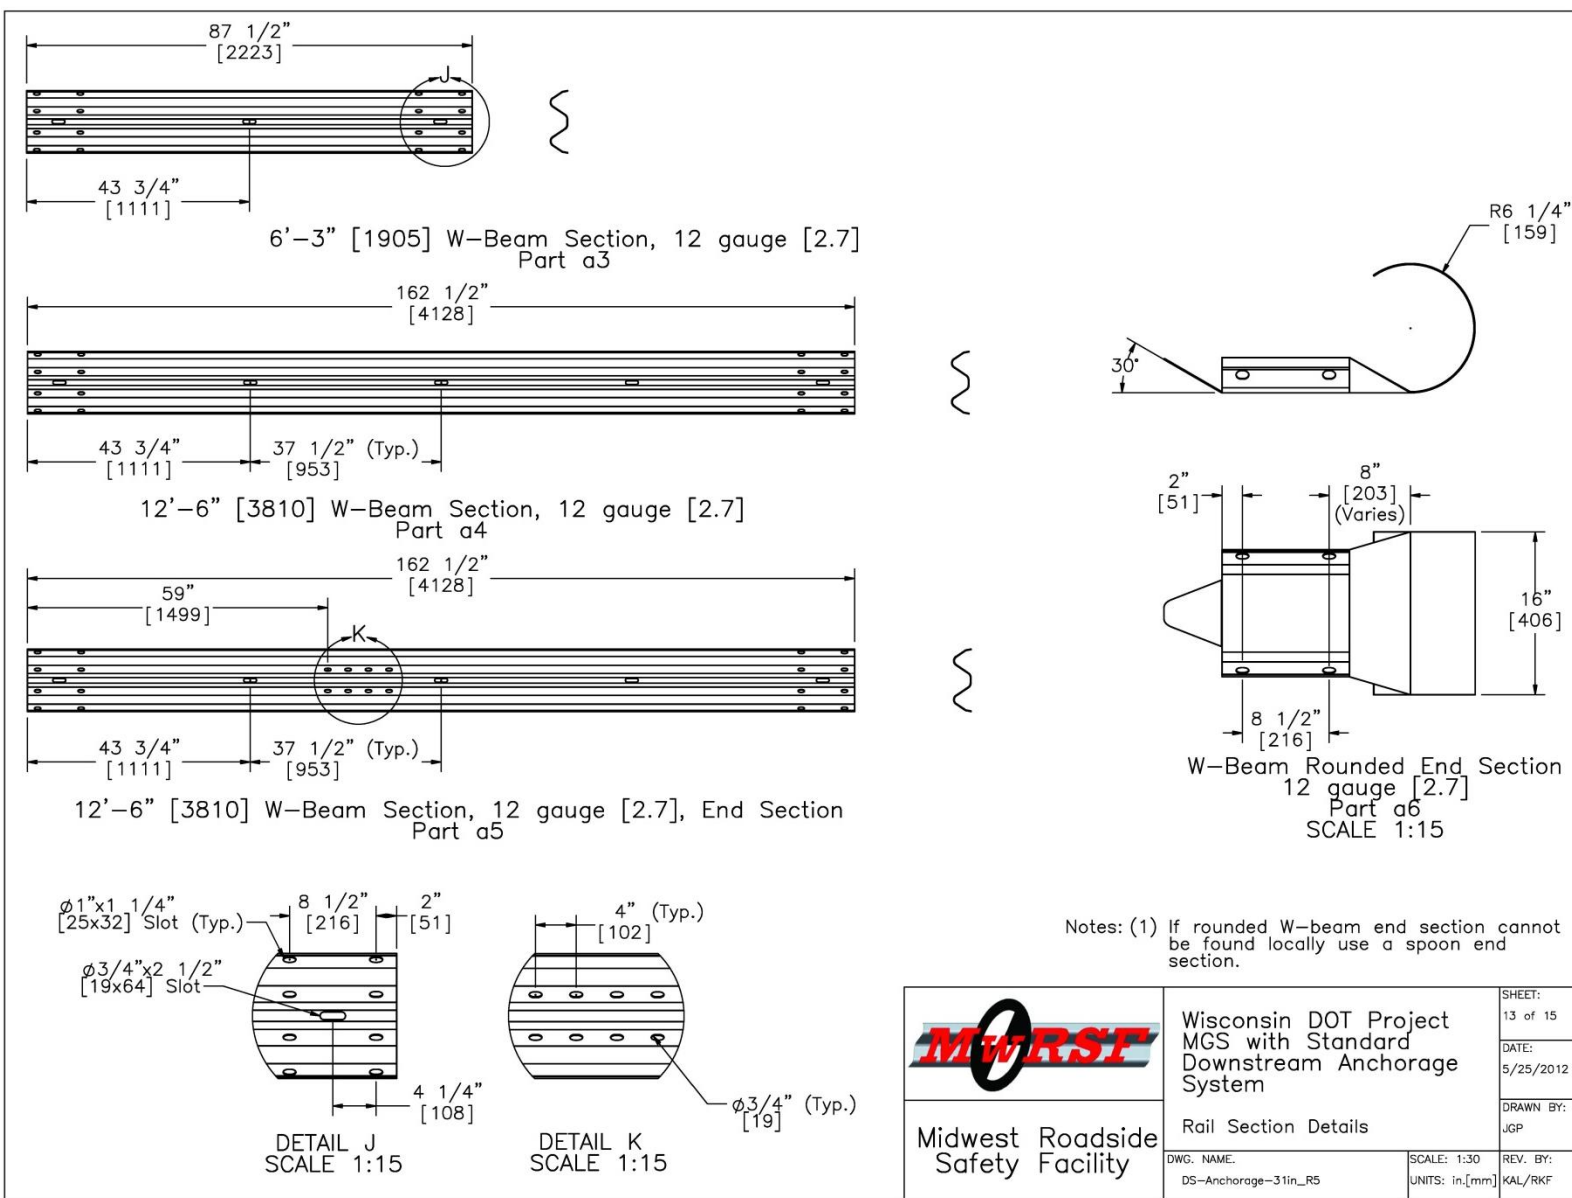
W-Beam Guardrail Details, Test No. WIDA-1
